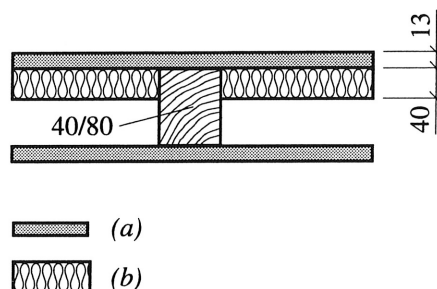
Example for separating wall REI 30. (a) Wood-based panel, (b) insulating layer.
